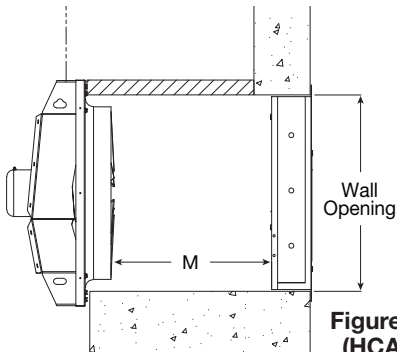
Direct to Wall (HCAI Seismic Rated) Installation
